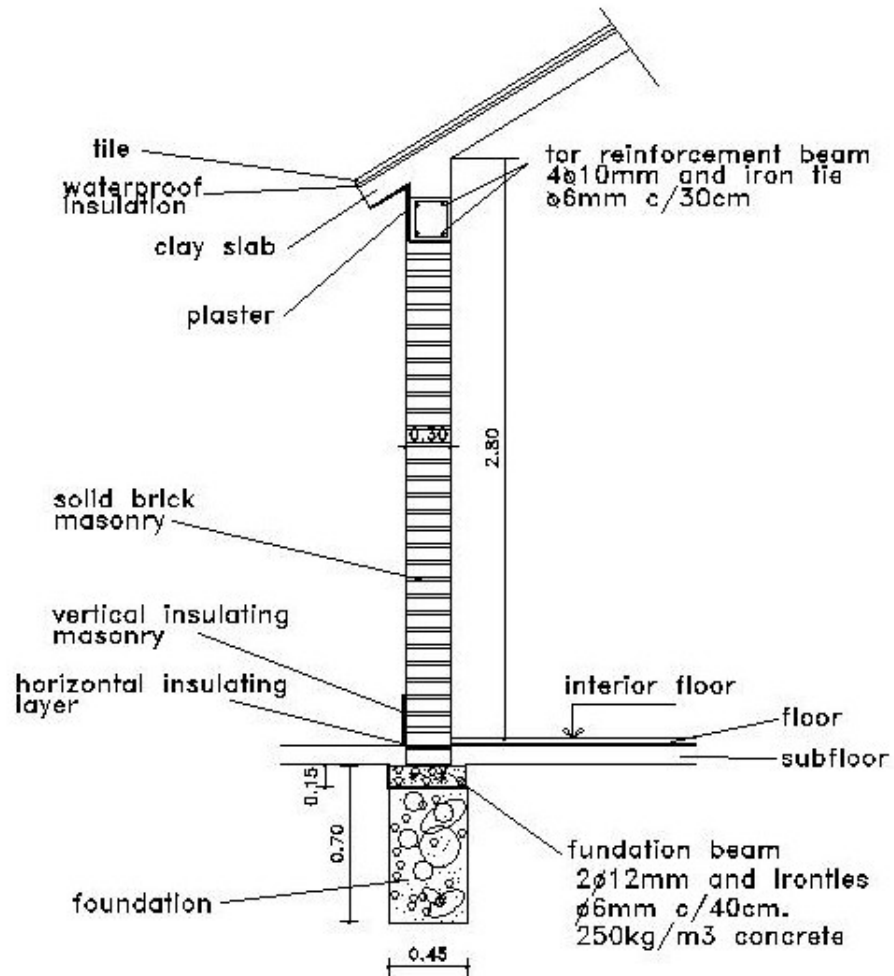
Critical Structural Details (e.g. wall section, foundations, roof-wall connections, etc.)
